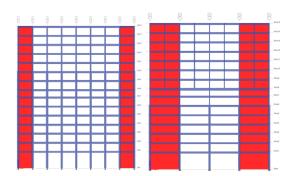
Elevation of Building Model-3 along y-dir. Fig 10: Elevation of Building Model-3 along x-dir.
